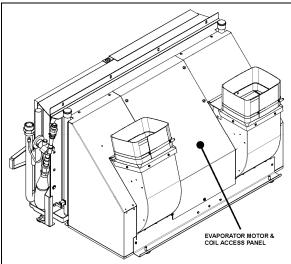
EVAPORATOR COIL ACCESS PANEL (TYPICAL) 22309
